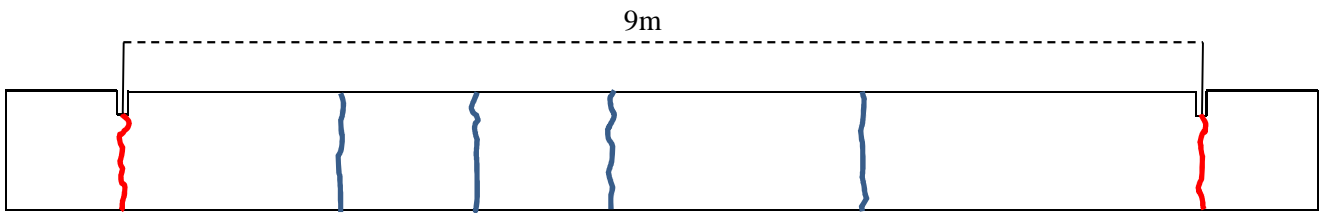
The crack pattern of a 9 m joint spacing slab containing 8 kg/m³ fibres
